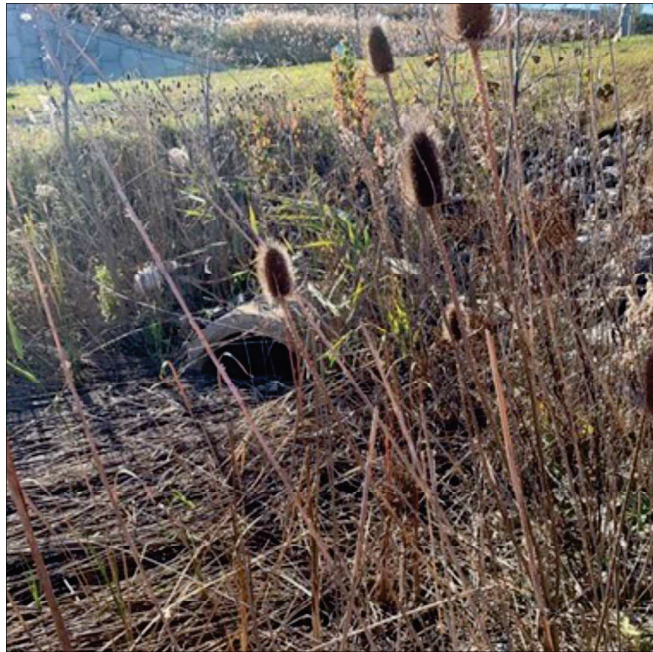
Concrete culvert west of Study Area Limits, north of County Road (CR) 46.
